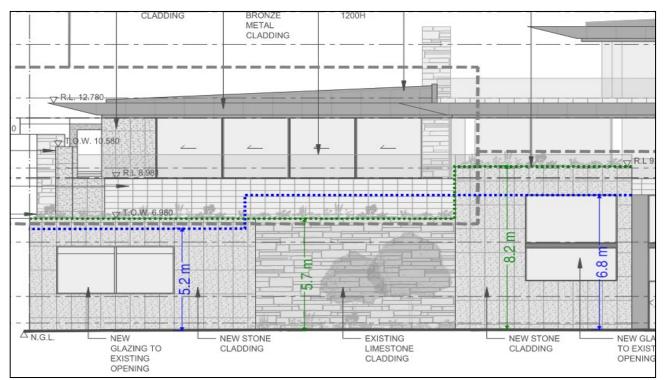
Diagram of existing western boundary wall height (blue) and proposed boundary wall height (green).
